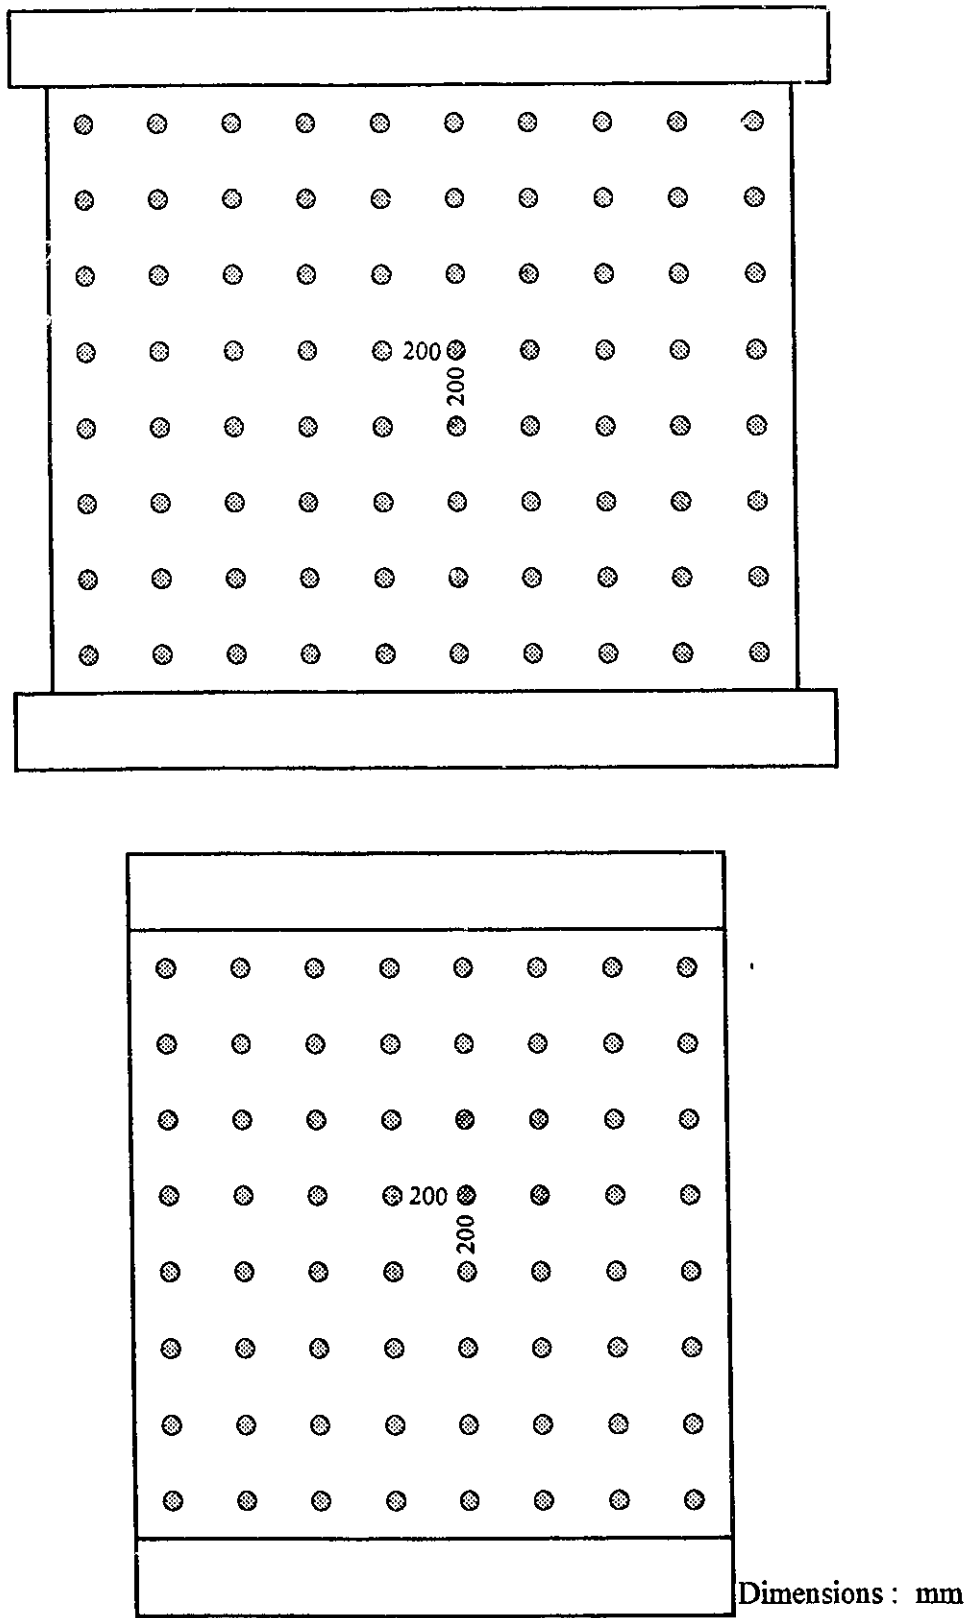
Arrangement of Demec Targets on Wall7 (above) and Wall 8 (below)
